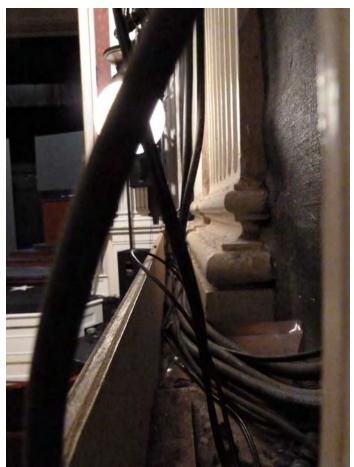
Hidden pilasters and murals due to attempt to hide wires (Photo taken by Jason Cantu
